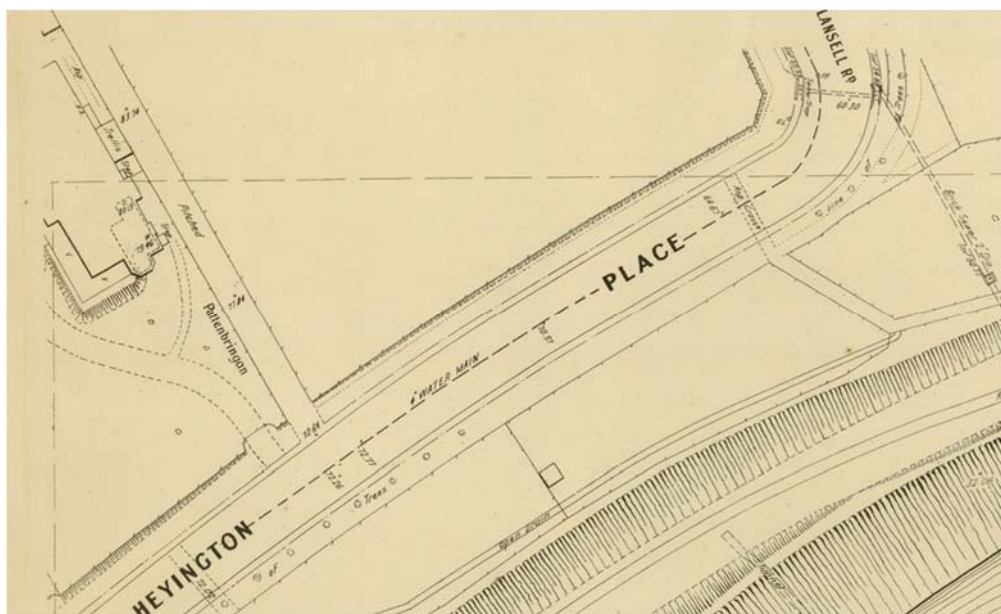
MMBW detail plan. No. 928, Richmond & Prahran, 1907 (SLV)
